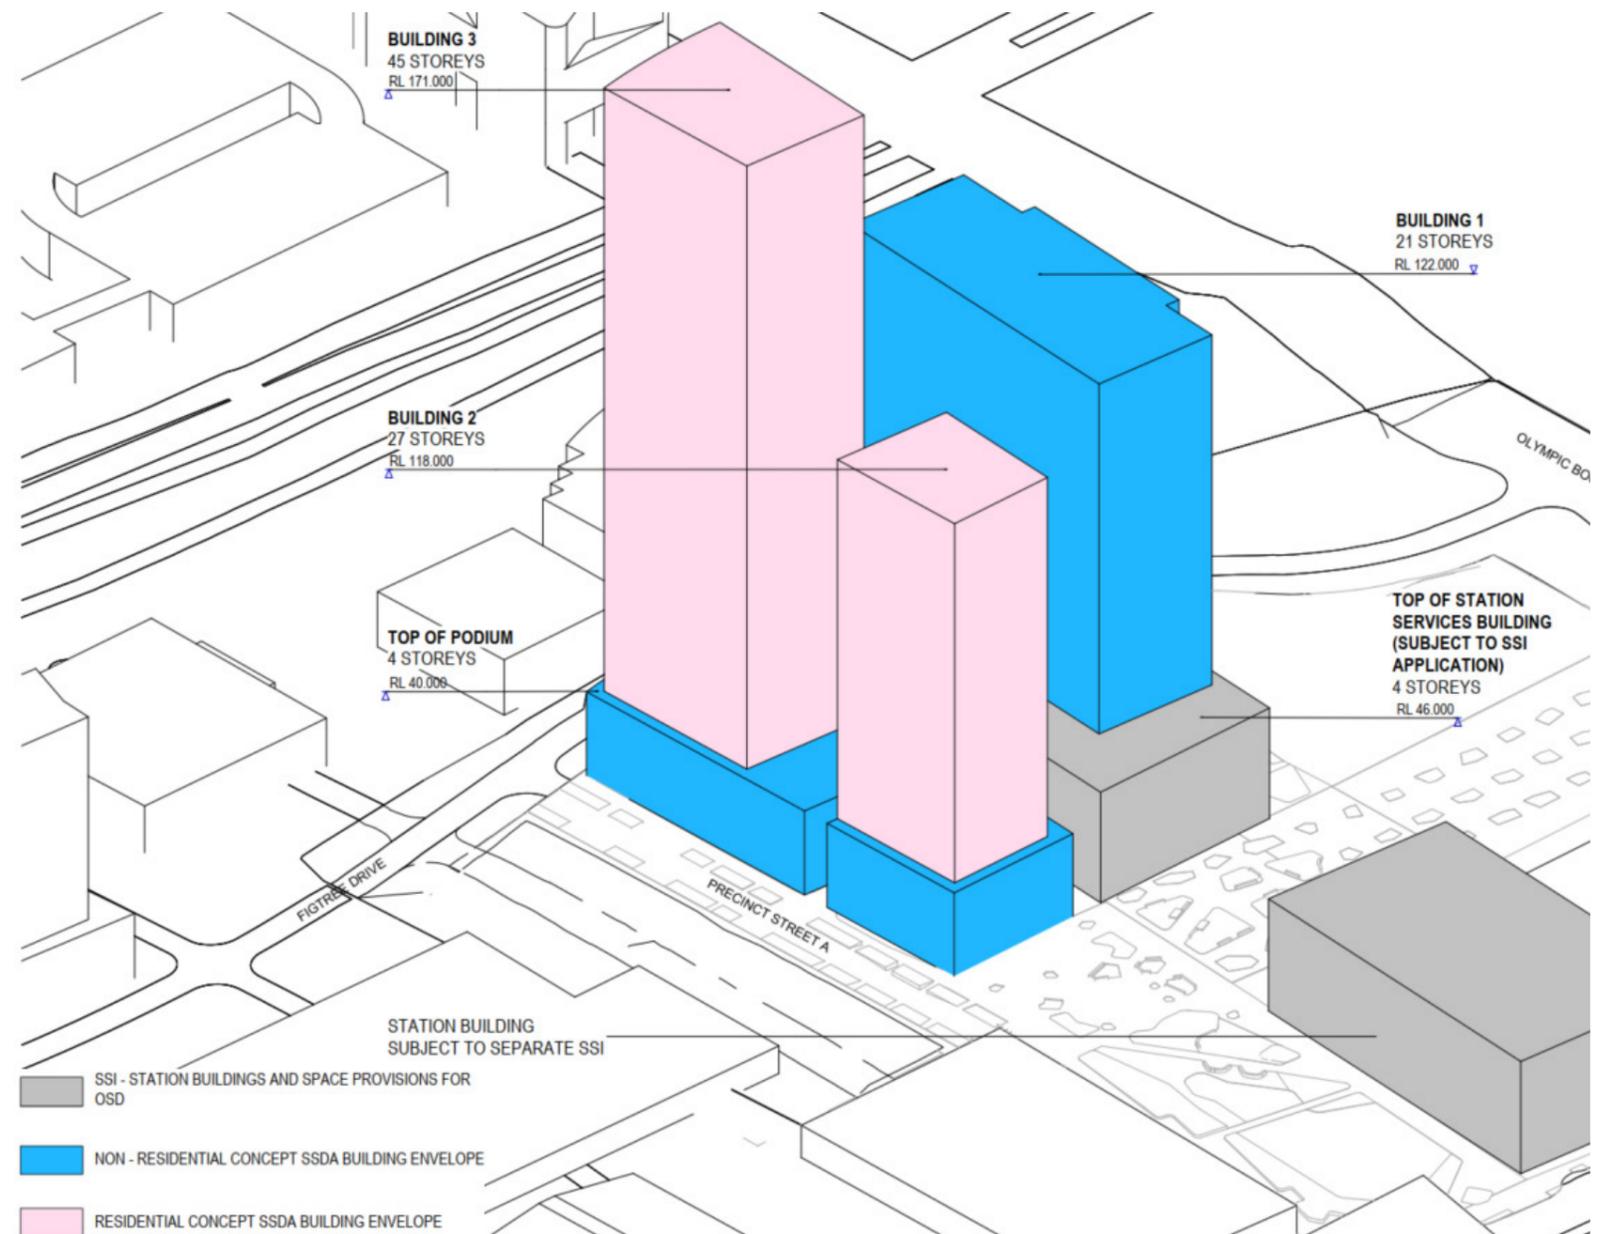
Proposed Concept SSDA development and CSSI scope
